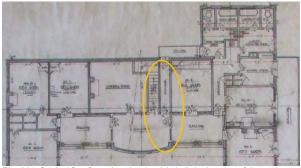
Original first-floor plan showing (circled) the location of the subject interior alterations (current Space 1.31) including removal of passage wall.
